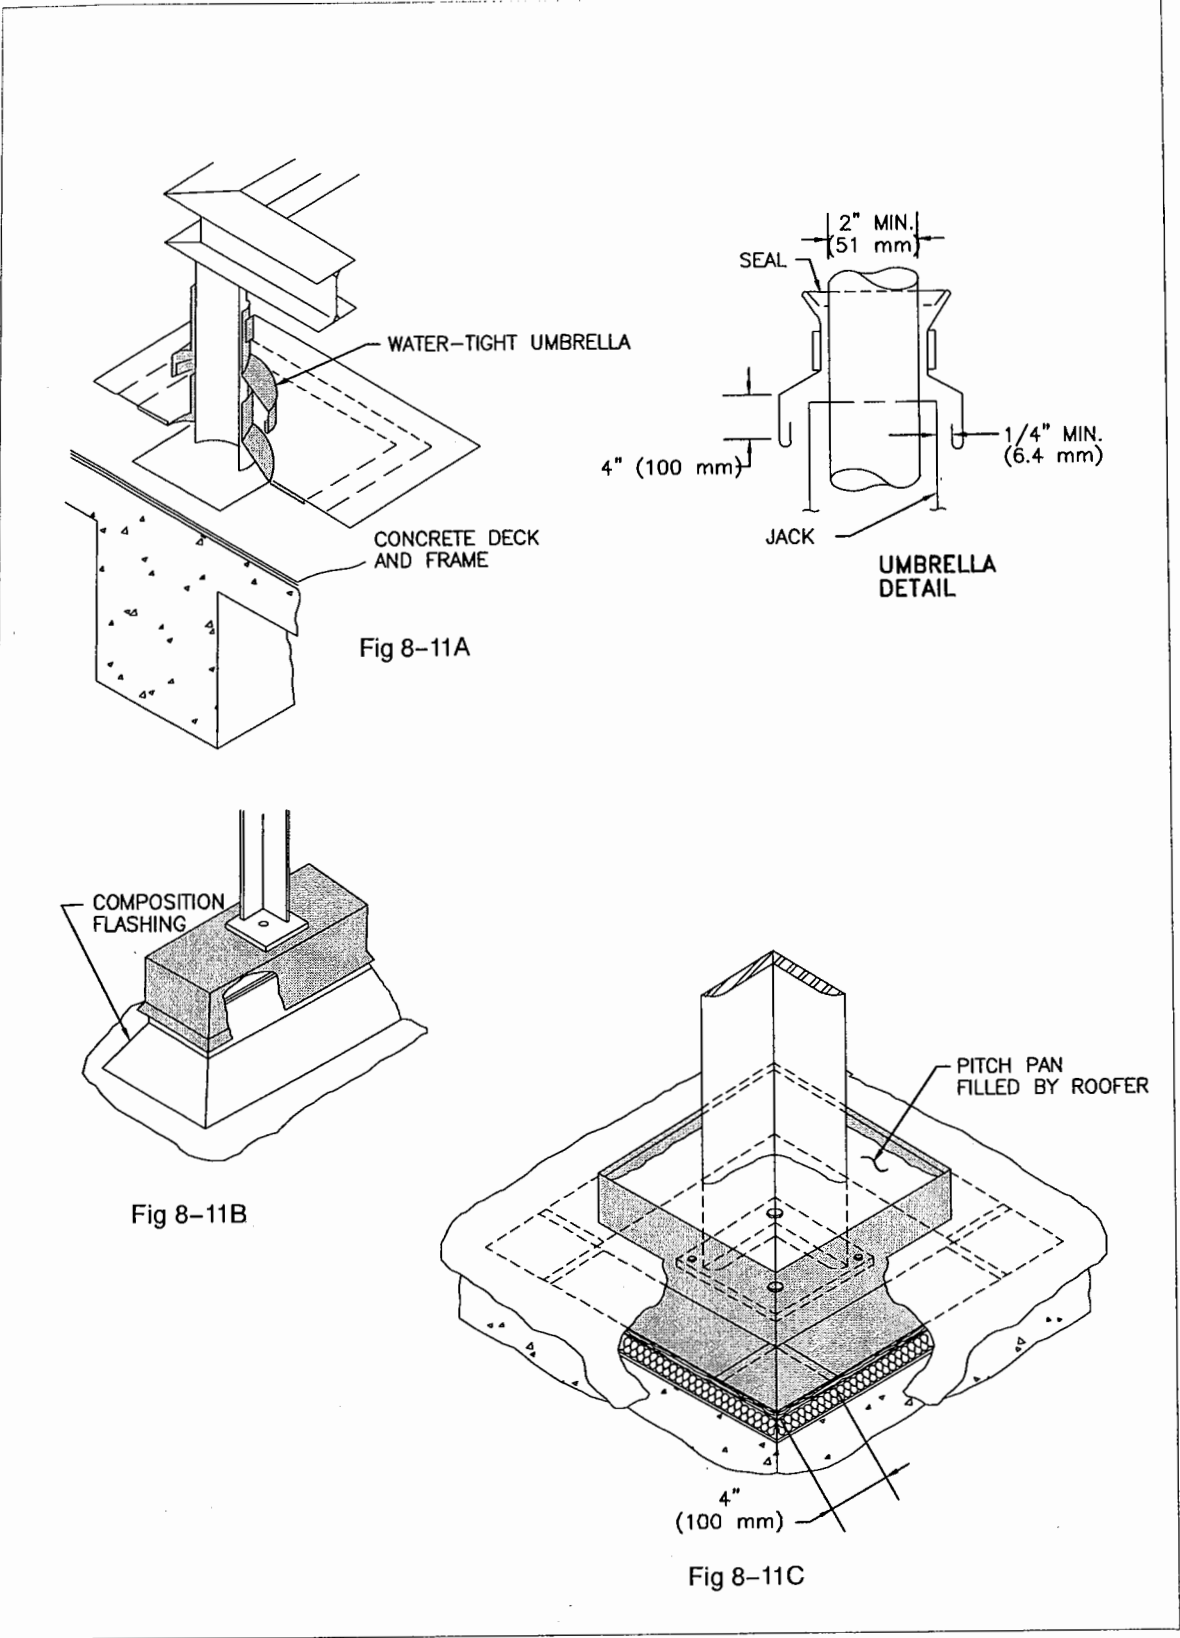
EQUIPMENT SUPPORT FLASHING
